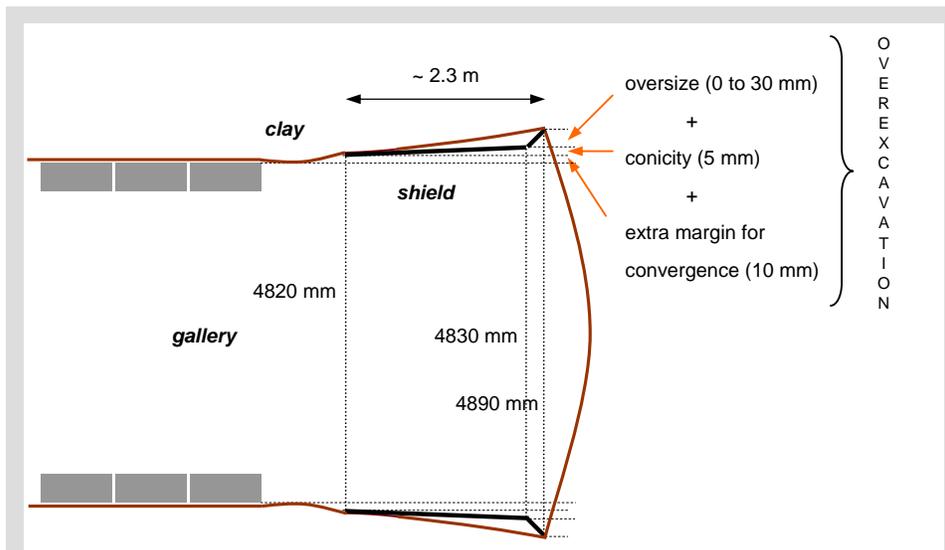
Cross section of the tunnelling shield, showing its conical shape, the adjustable knives providing the oversize, and the total overexcavation (not on scale).
